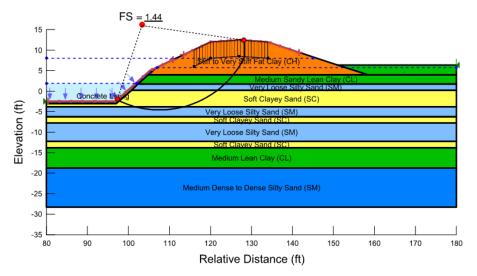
Rapid Drawdown Stability Result (Cross Section BB)
